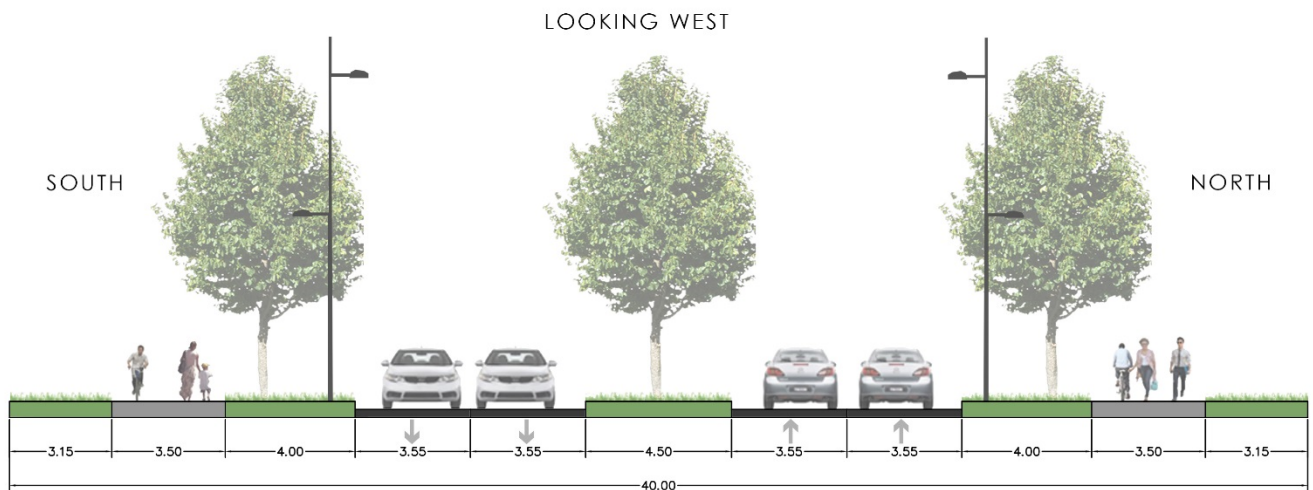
SHERWOOD DRIVE WEST OF BRENTWOOD BLVD SOUTH AND BRENTWOOD BLVD SOUTH TO THE ARP BOUNDARY (40 M)
